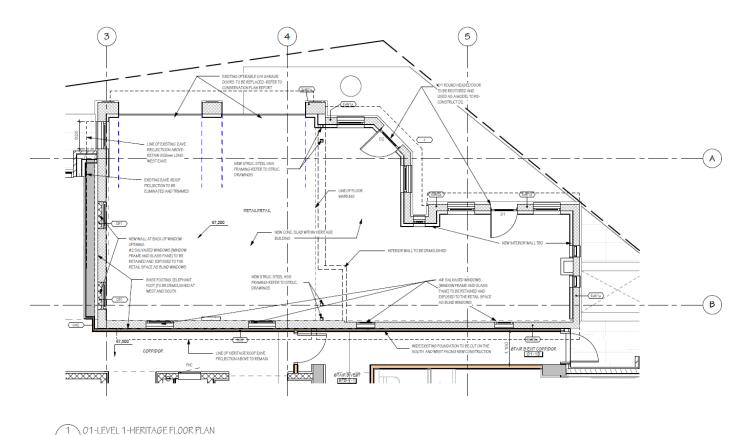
Retail floor plan documenting the areas of impact. Source: Hobin Architecture 2023.
